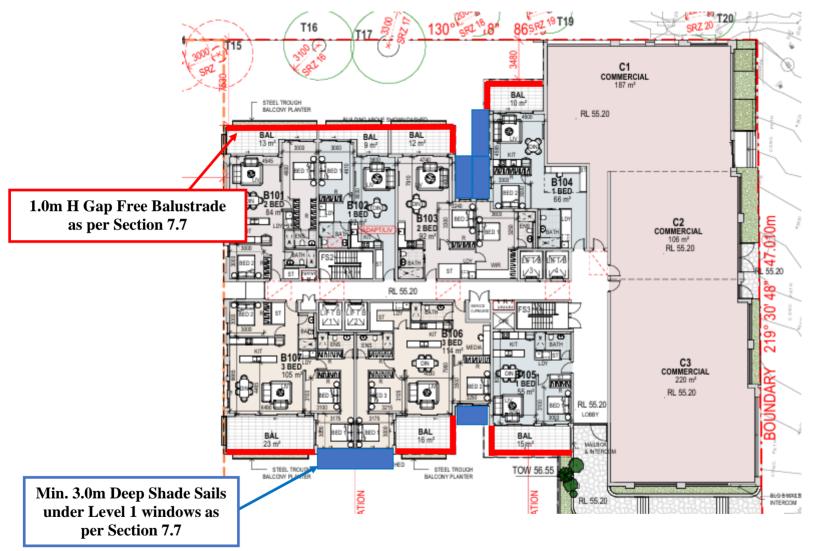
Proposed Sound Barrier & Shade Sail Location - Level 1
